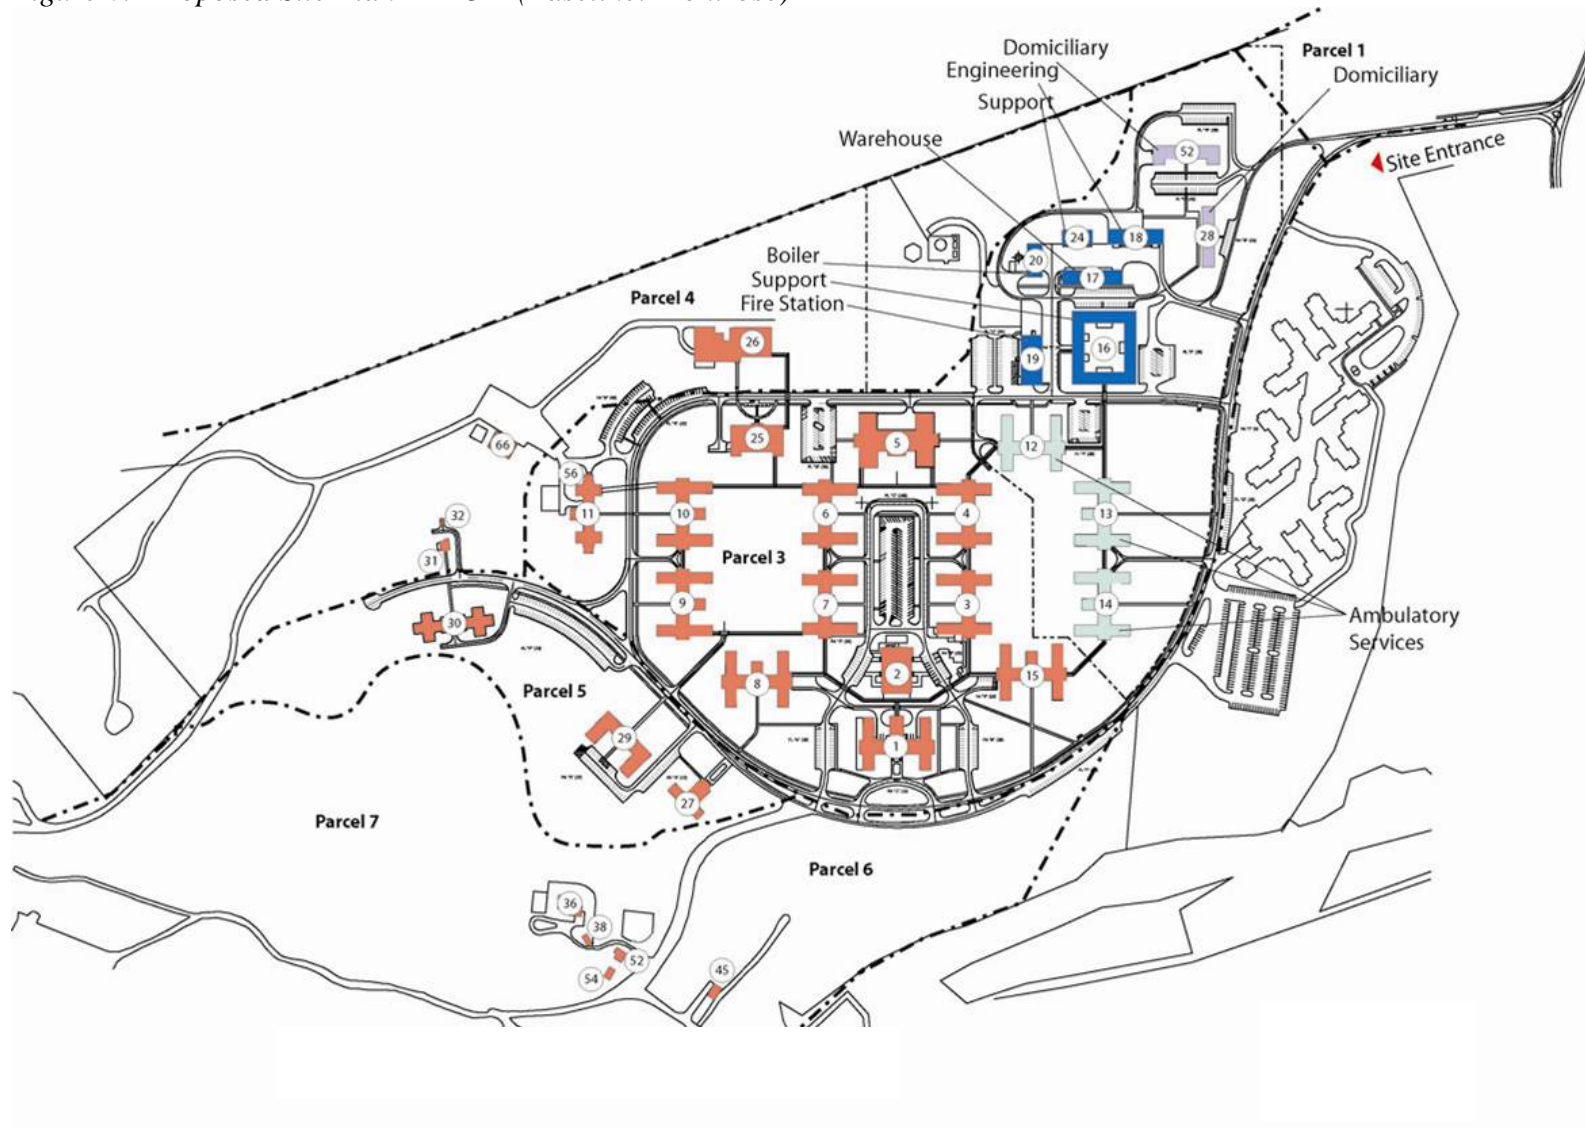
Proposed Site Plan - BPO 1 (Baseline: Castle Point)
